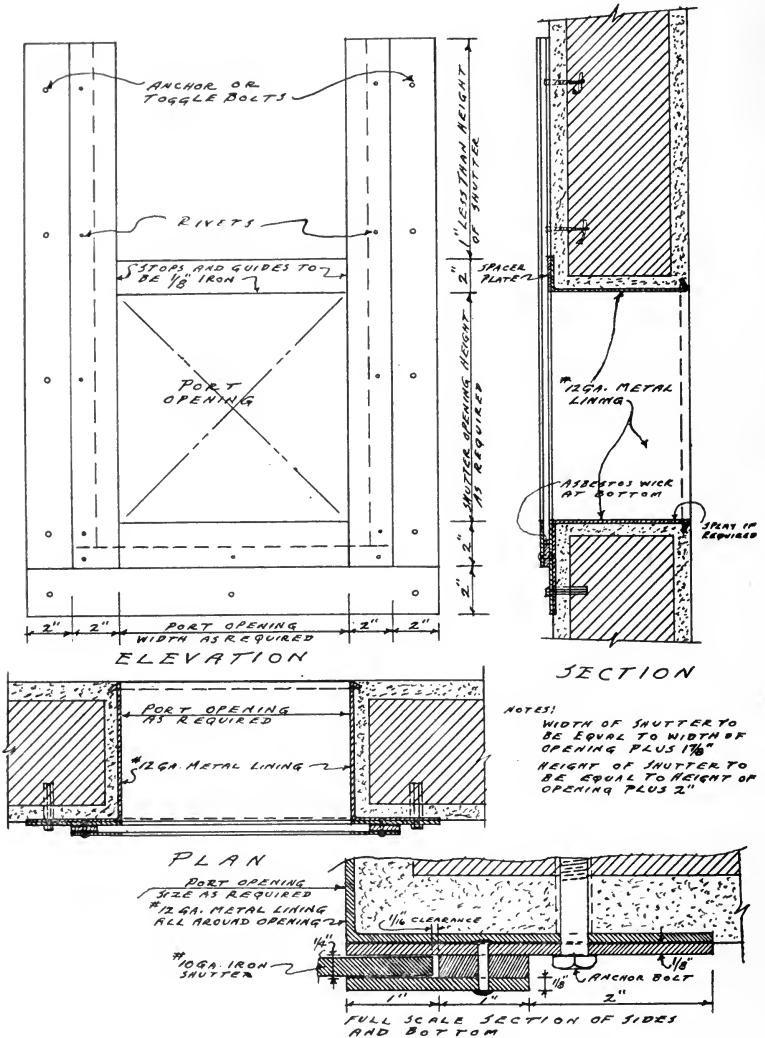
Example of port shutter construction. Although this construction shows rivets, spot welding is preferable.
